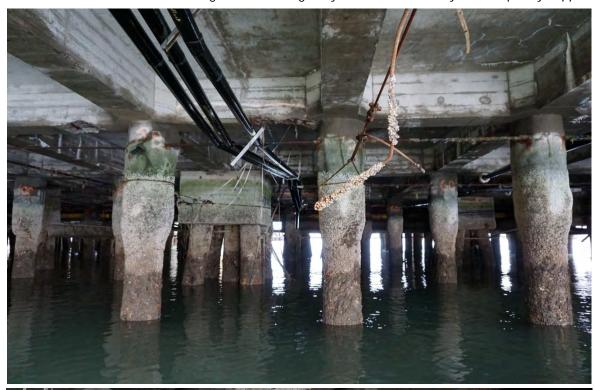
3- 4" conduit 80' conduit run under Wharf (2 pictures)
